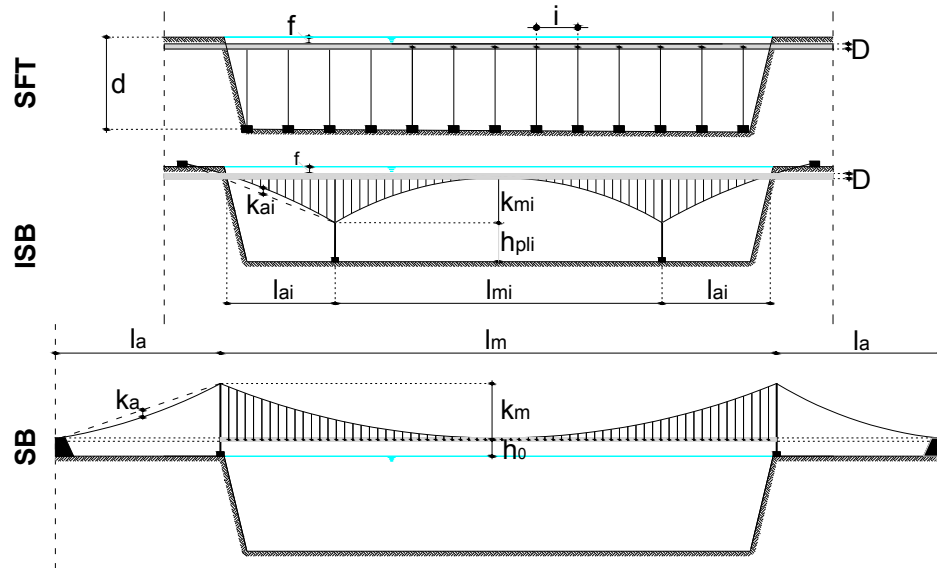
Geometrical configuration of the considered Submerged Floating Tunnel, Immersed Suspension Bridge and Suspension Bridge
